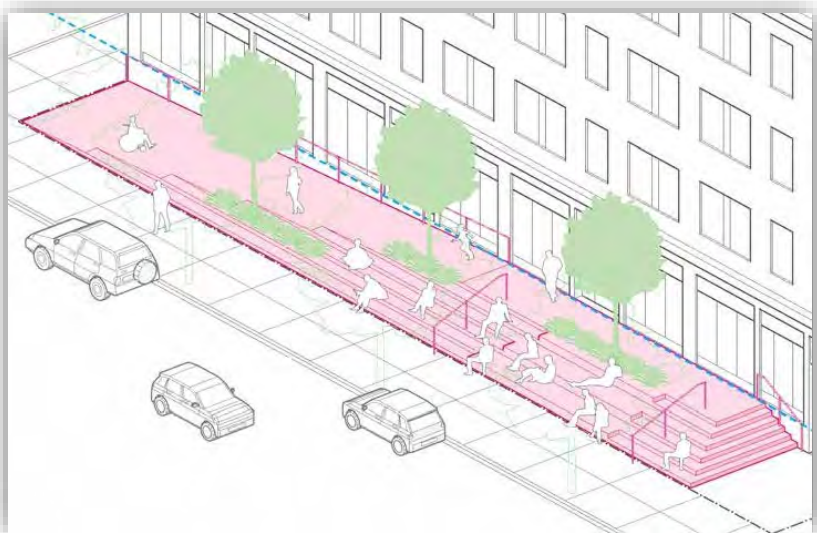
Elevate lowest interior floor and provide exterior circulation to the SLR-BFE. Source: *Coastal Flood Resilience Design Guidelines*, Boston Planning & Development Agency.
